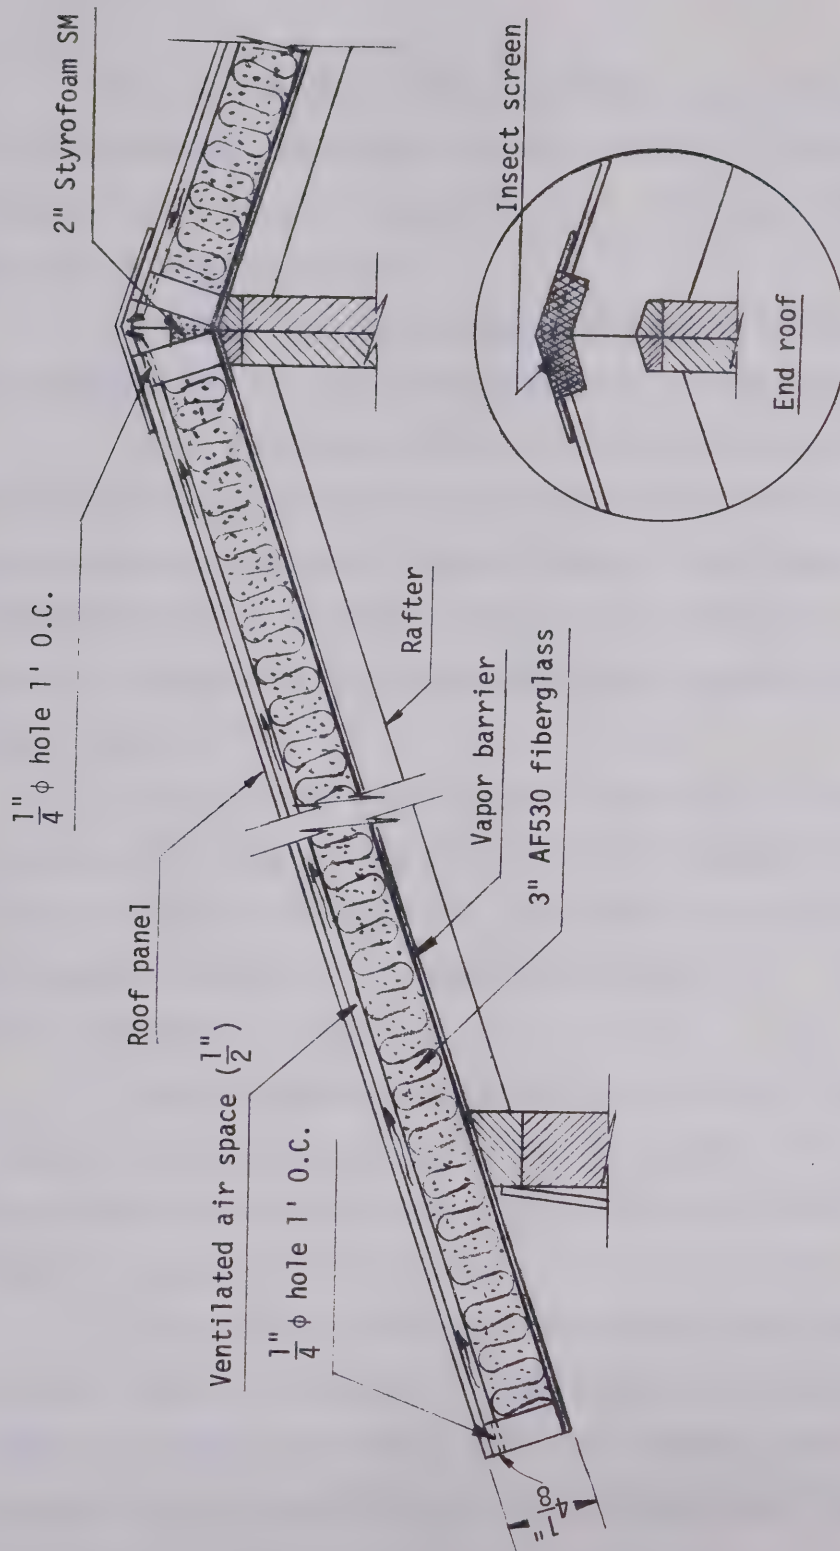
Air ventilation and vapor barrier in the roof panel
